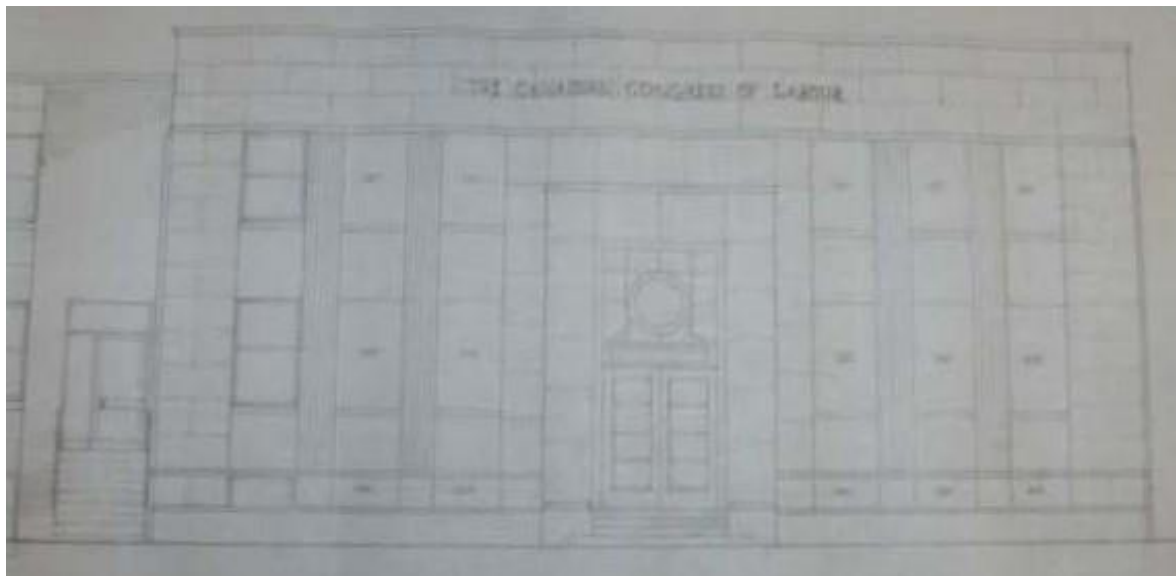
Elevation drawing from the 1959 set of drawings for the addition illustrating the original entrance configuration. Source: Library & Archives Canada.
